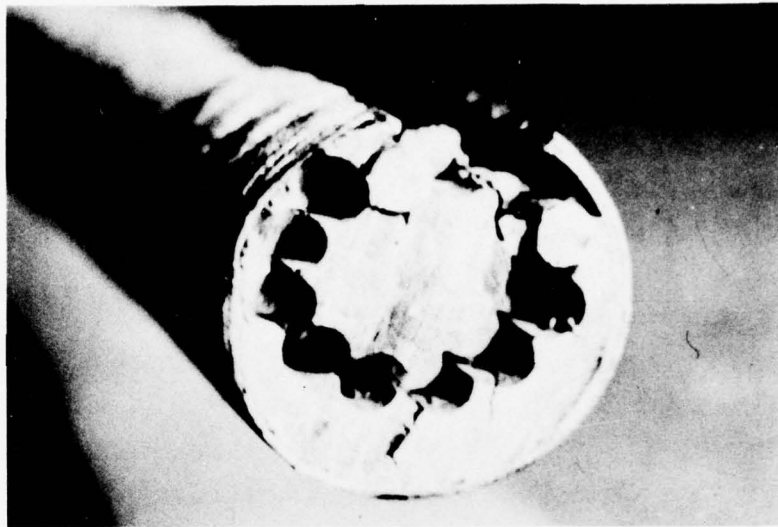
Strands at the seaward end of conduit in beam 6 after conduit was cut lengthwise. Note that 3 of the 12 strands did not shorten when the grout-steel bond failed
